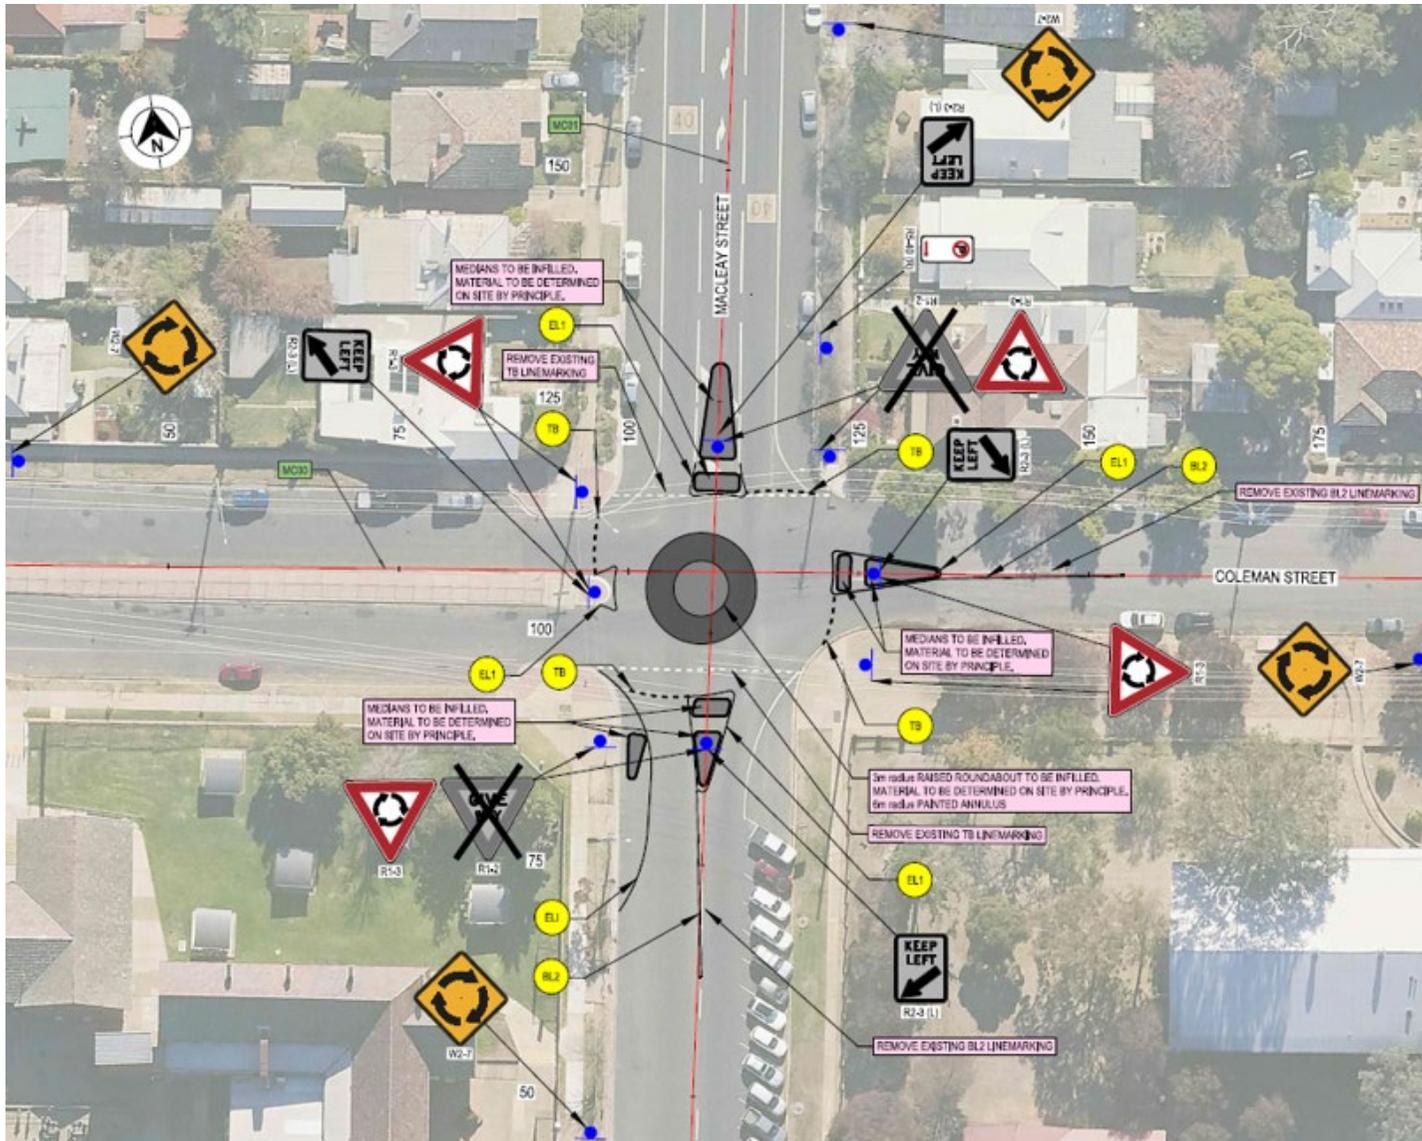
Proposed base mitigation measures at the intersection of Colman Street and Macleay Street
